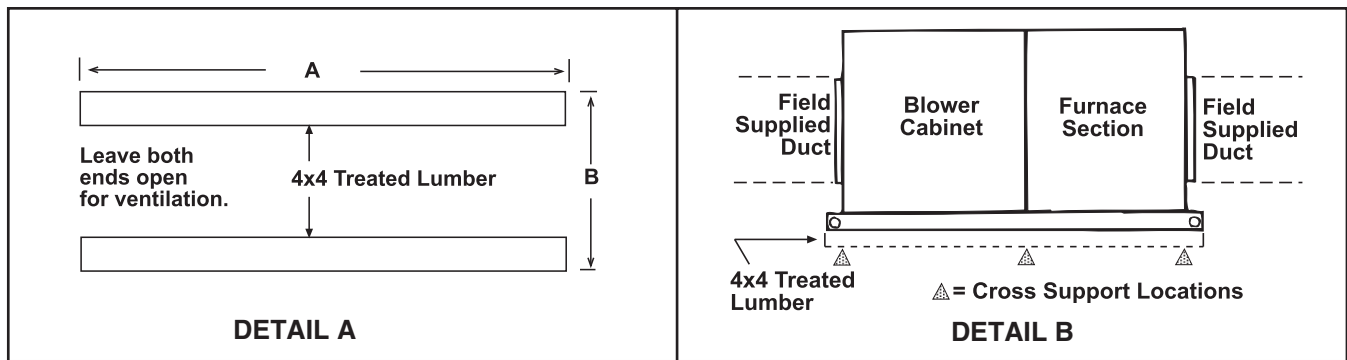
Field-Supplied Support Assembly (Refer to Table 8)
